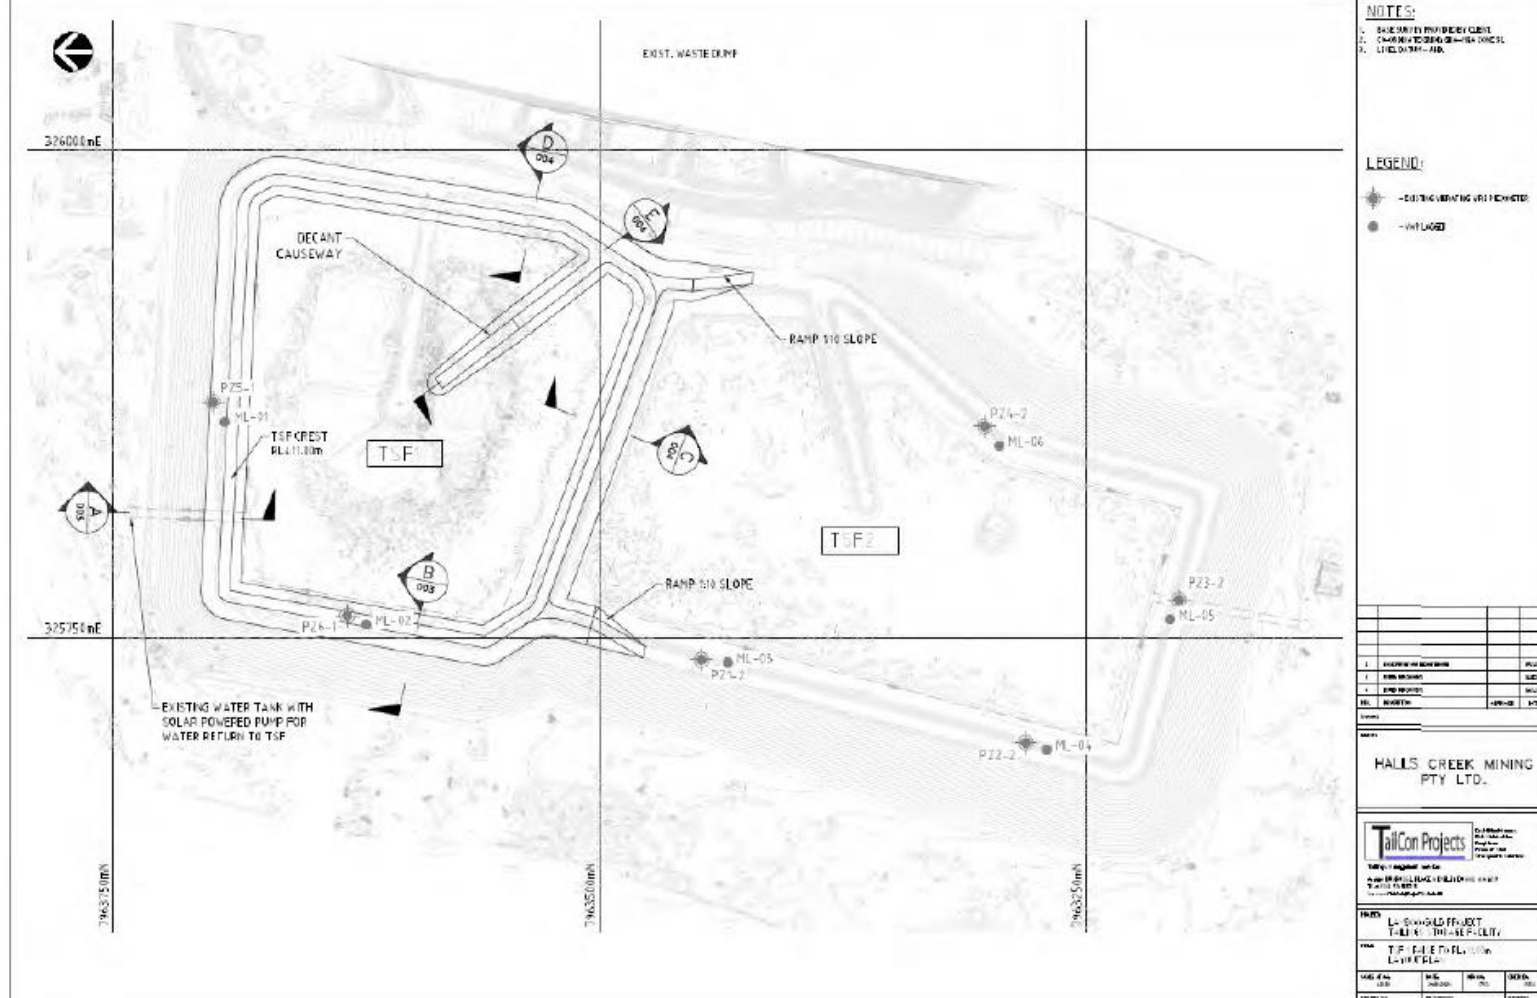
Lamboo Gold Project TSF2 Raise to RL411 m Layout Plan
